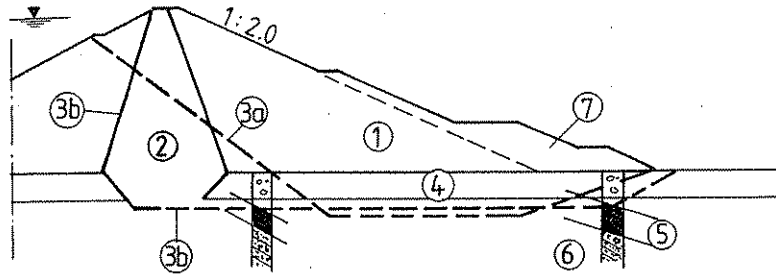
Sliding stability. Example of Mornos dam with mylonites in the foundation.
